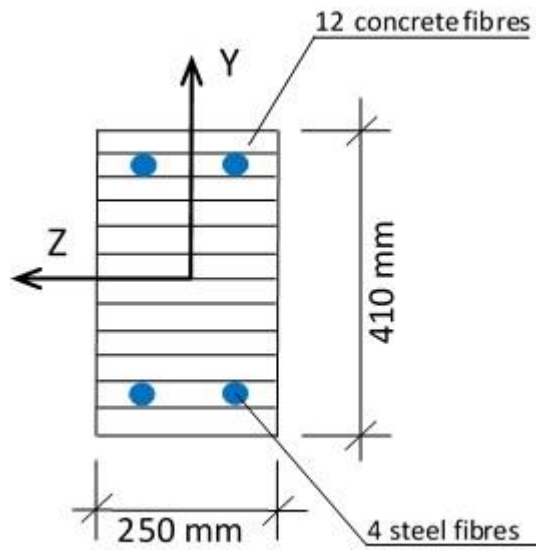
Fibre beam element cross section mesh for sample SS3a-1.
